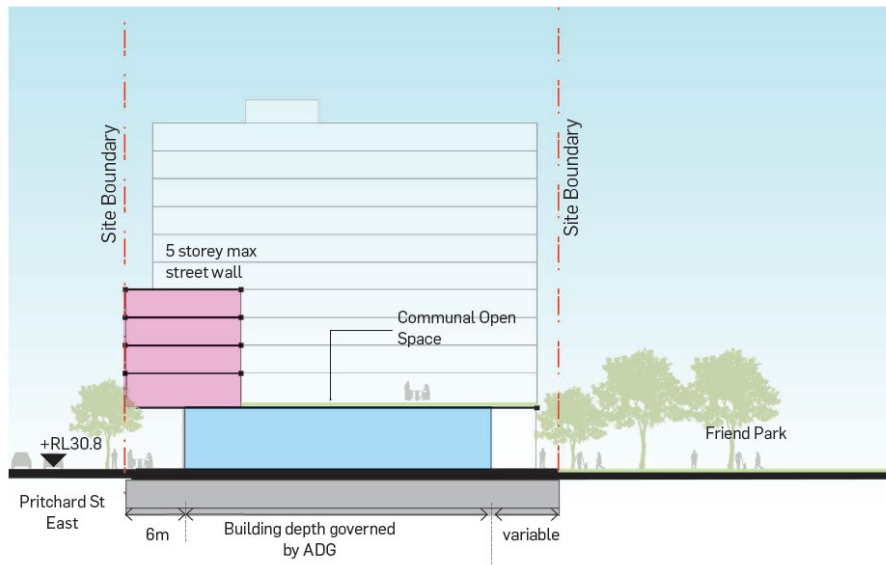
Section C-C through corner of Pritchard Street and Station Street Precinct (typical north – south podium section)
